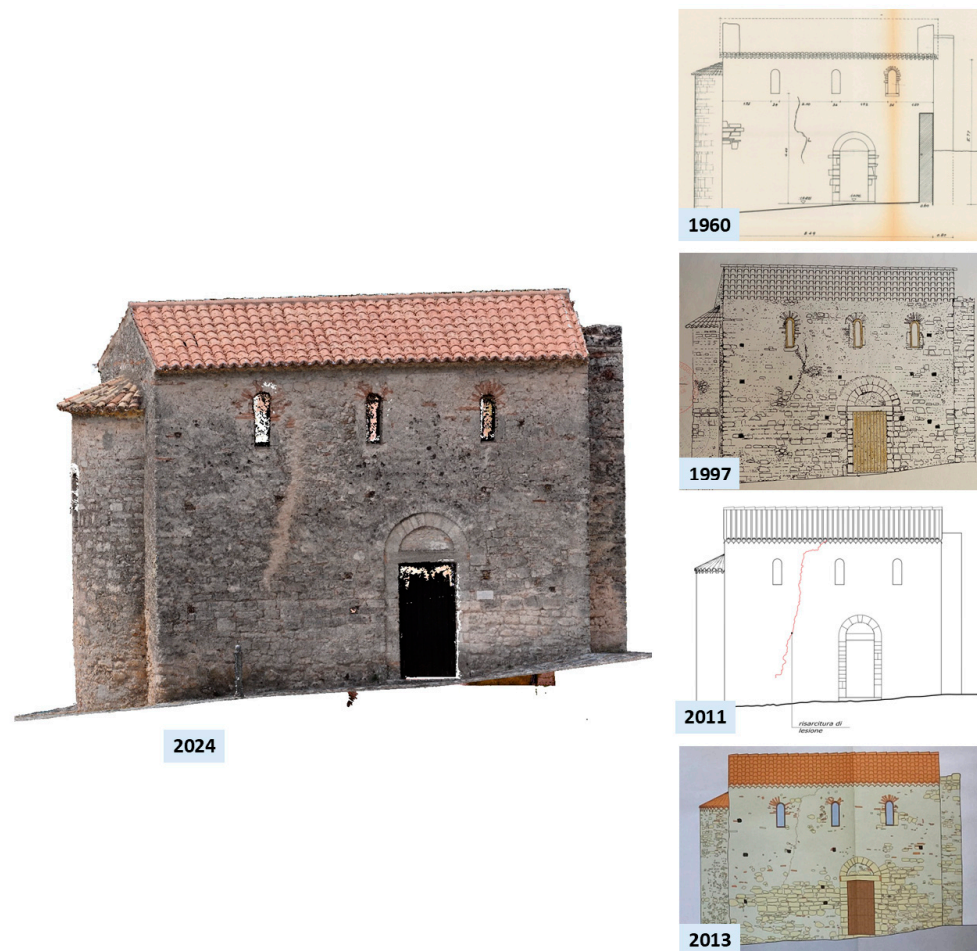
North wall fracturing pattern in the project's facade damage mapping plans.
